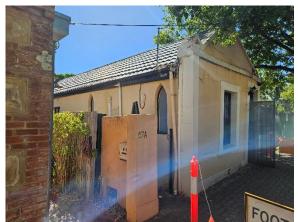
General view of northern elevation showing lean towards Council footpath and cracking towards top of gable
